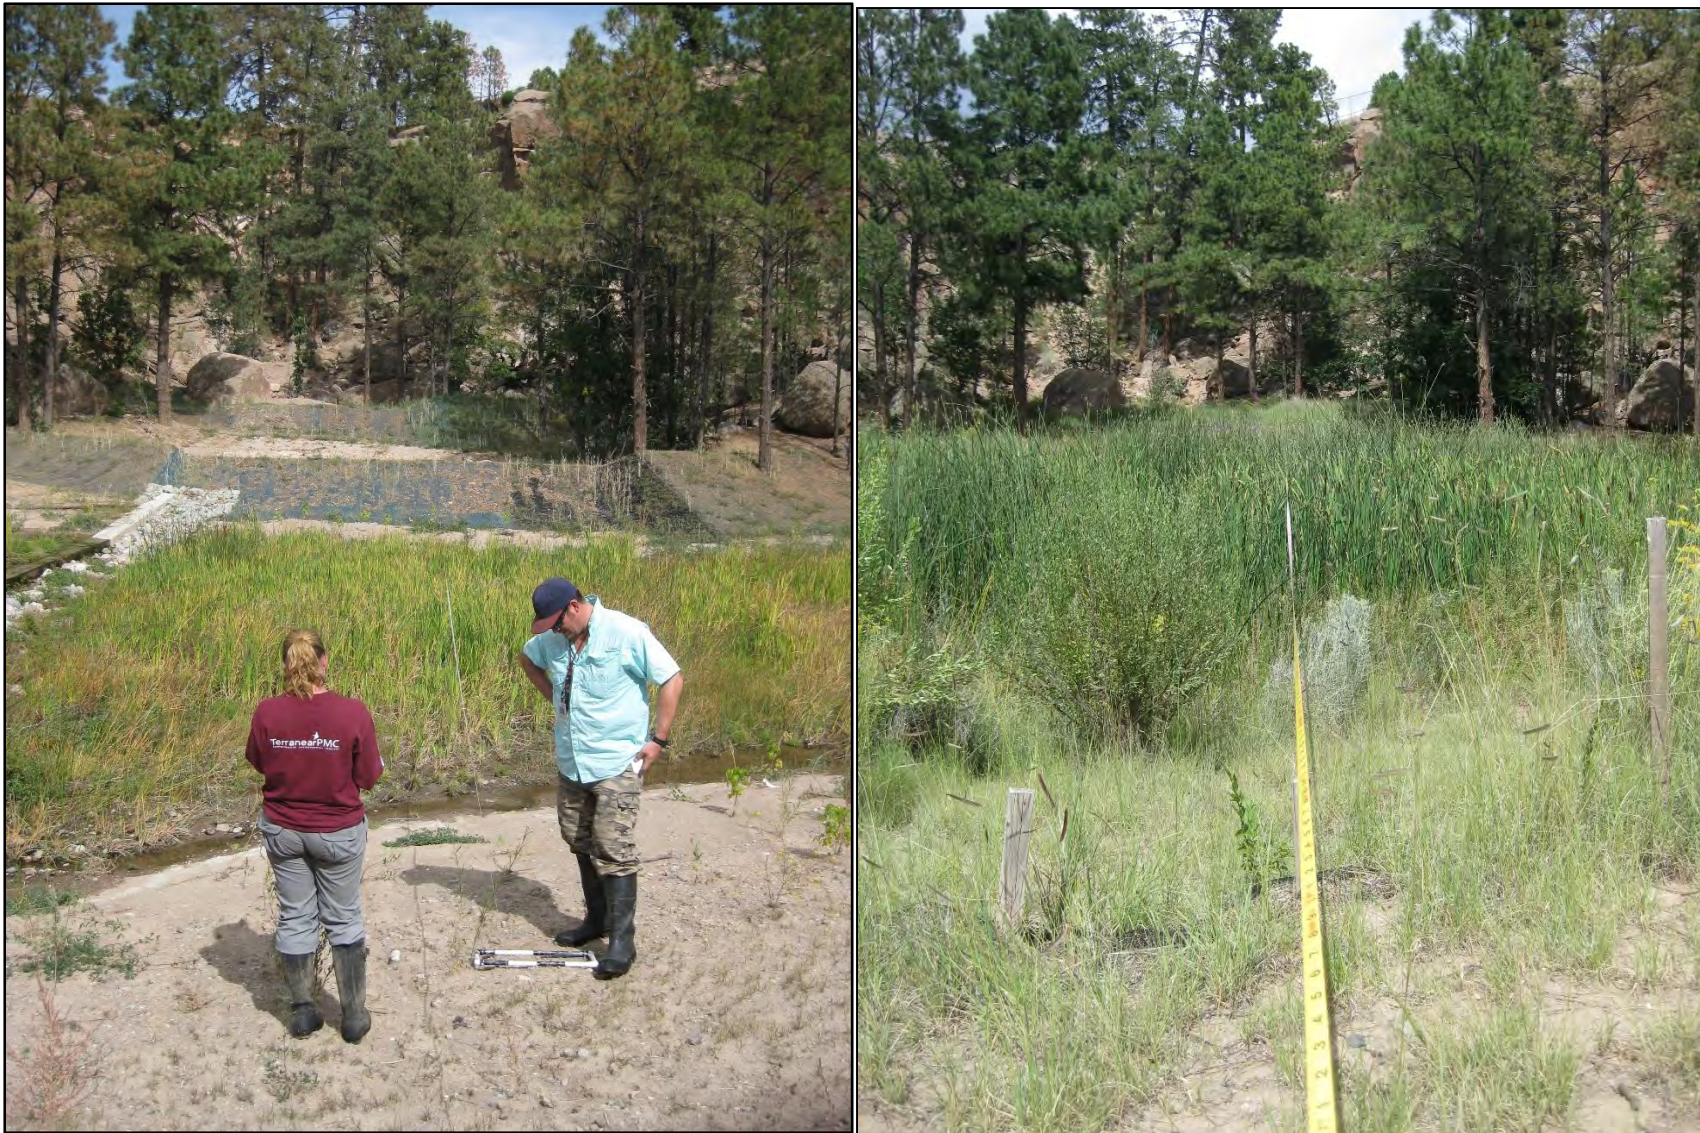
SGCS-20 photographs looking north, between sheet pile 1 and 2; (left) September 2014 and (right) August 2018
